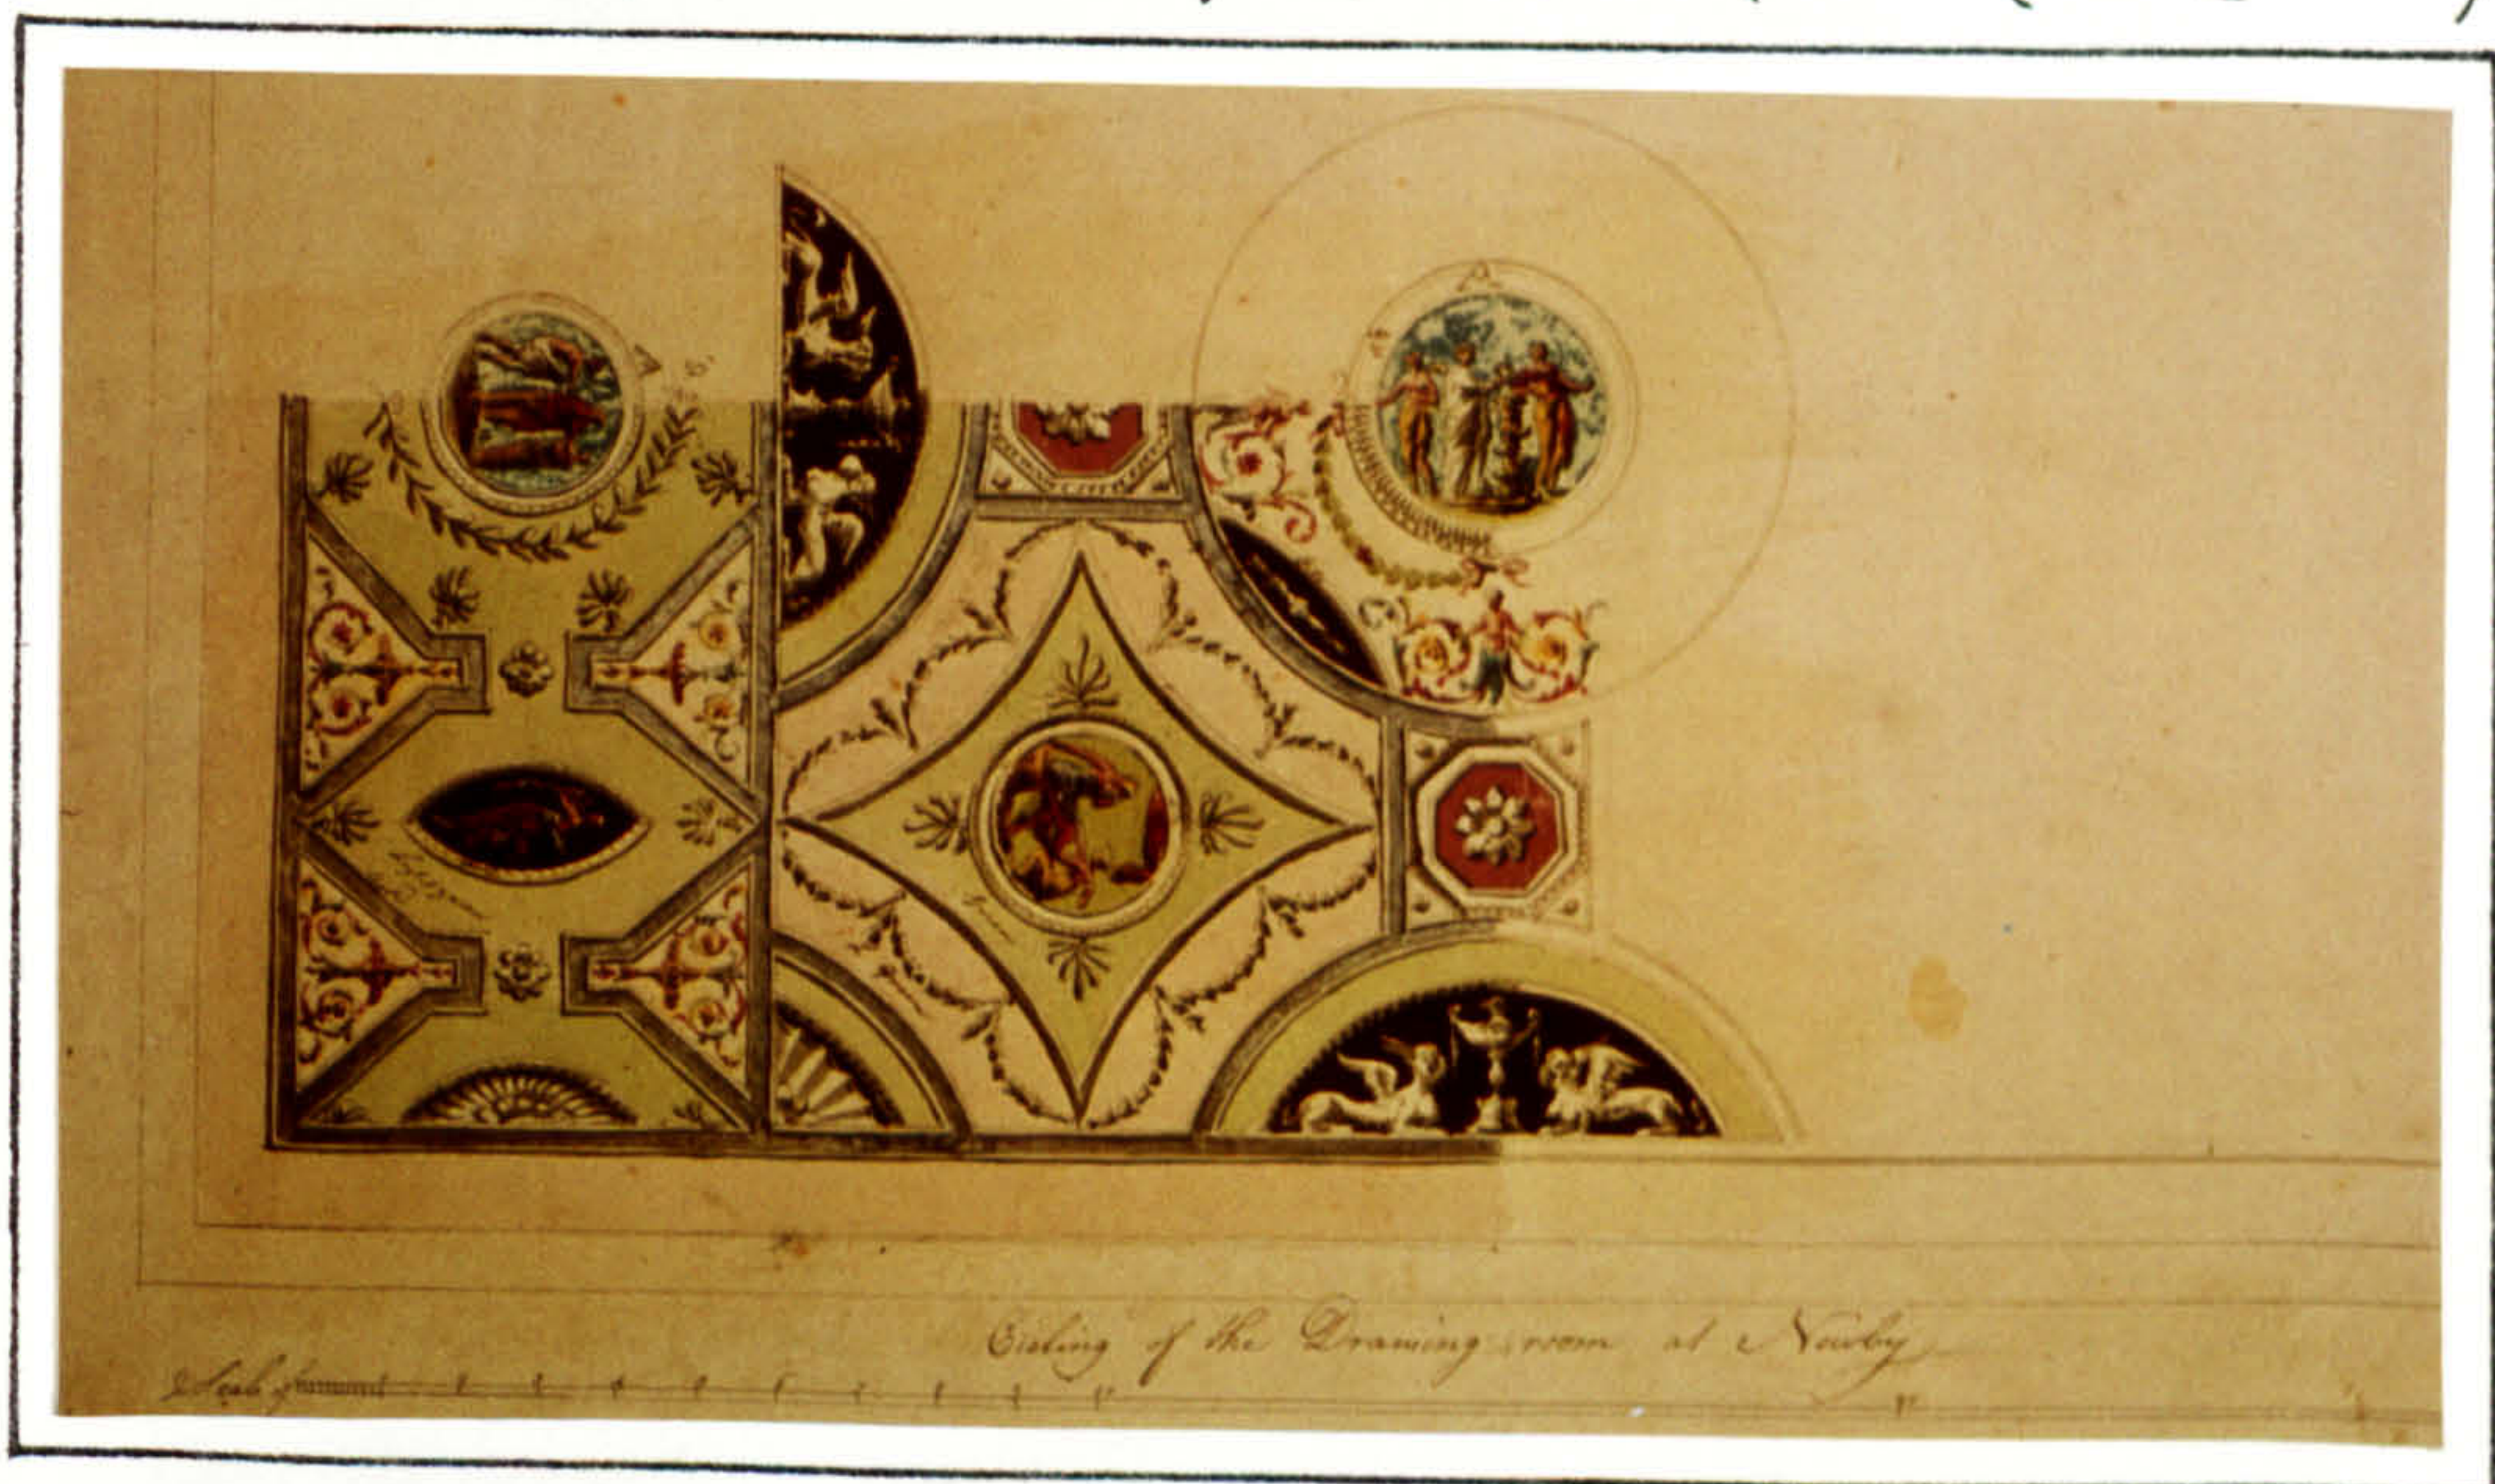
ROBERT ADAM · CEILING FOR DRAWING ROOM · NEWBY HALL · 1769
